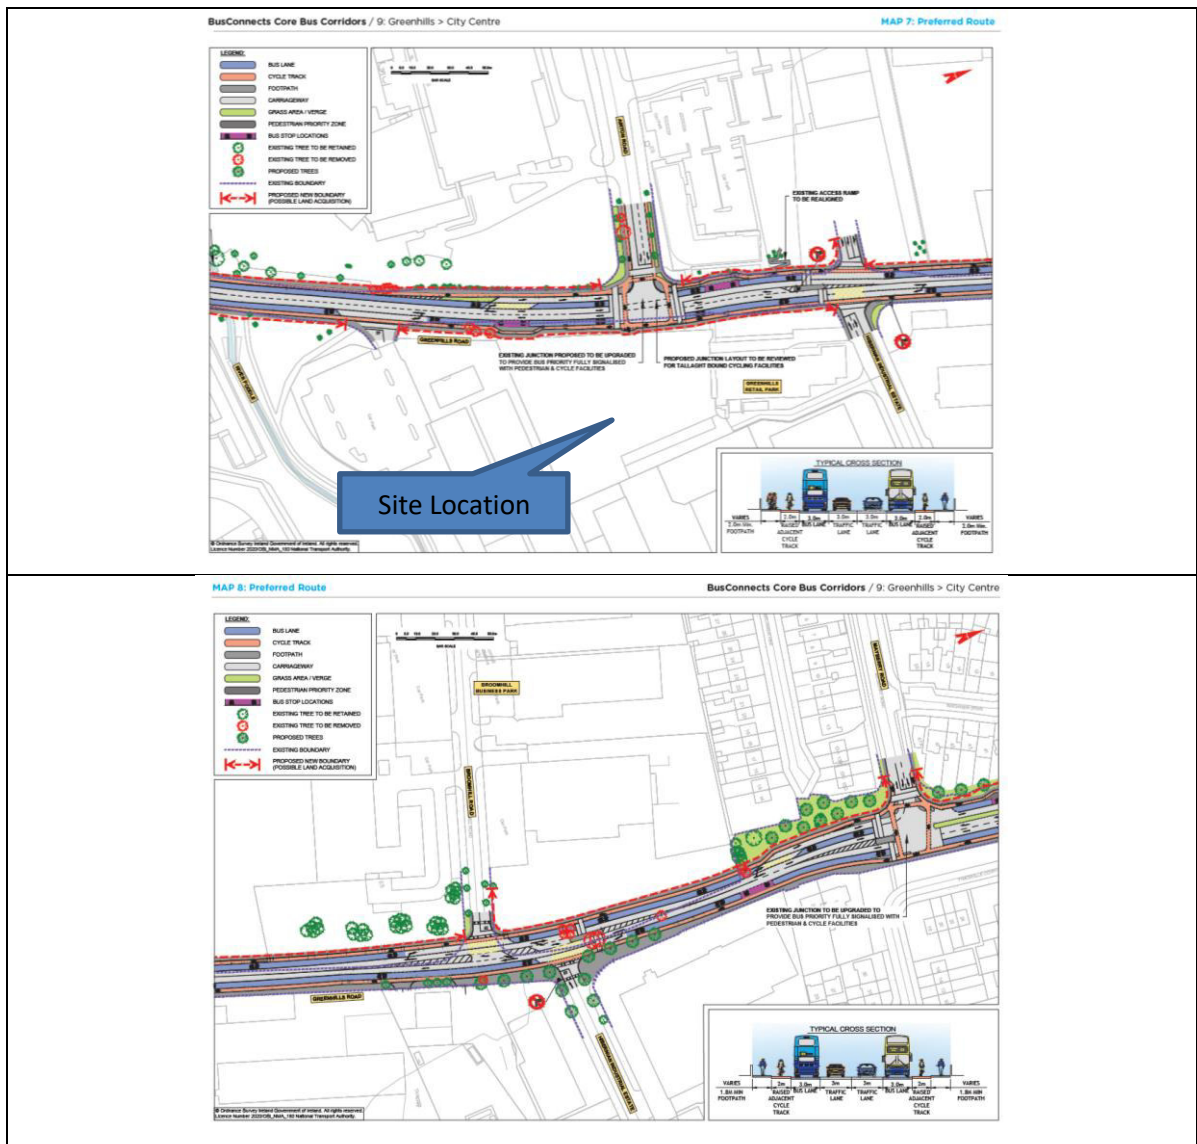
Core Bus corridor 9 – Road and Junction Layout
